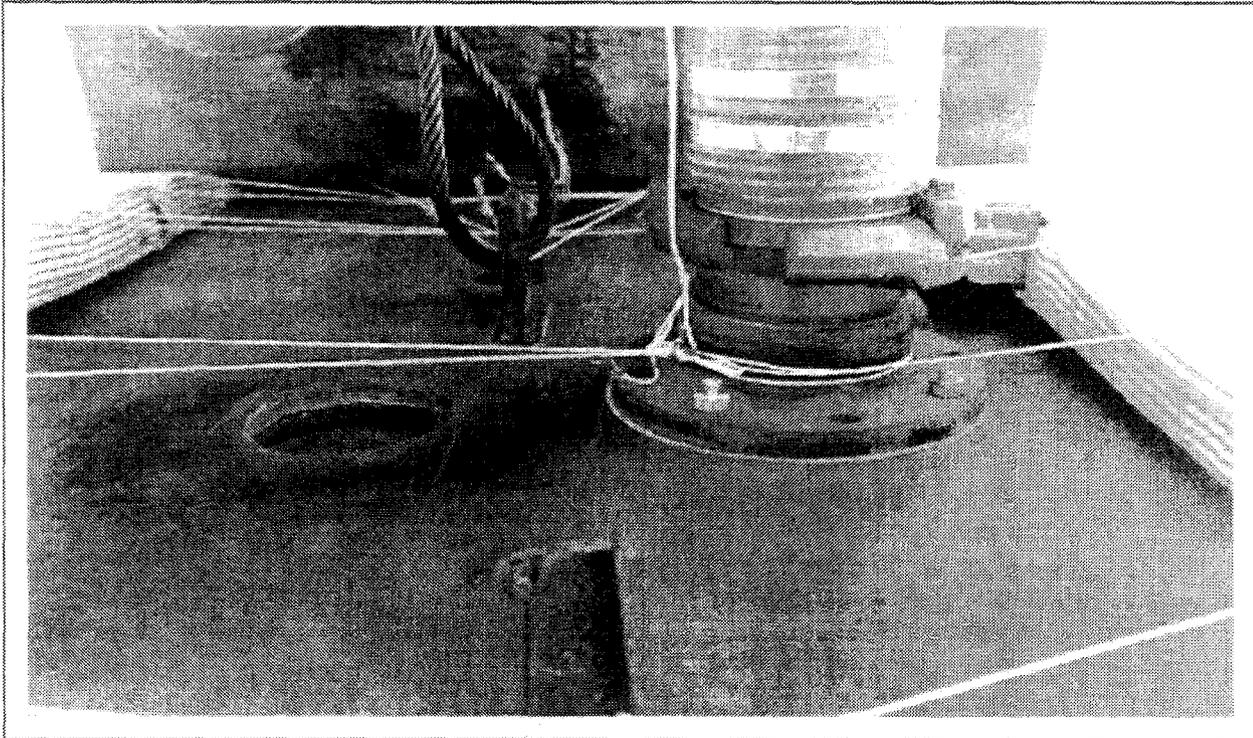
Aft Dunnage Patch Showing Pump Discharge Fitting.
